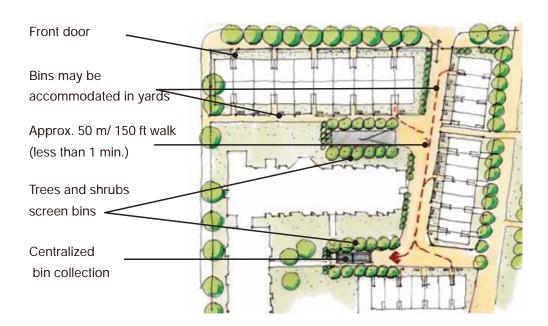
Conceptual sketch on Block 16- storage of bins and access to centralized bin area* *Note: Concept sketch only - Subject to City division approval
